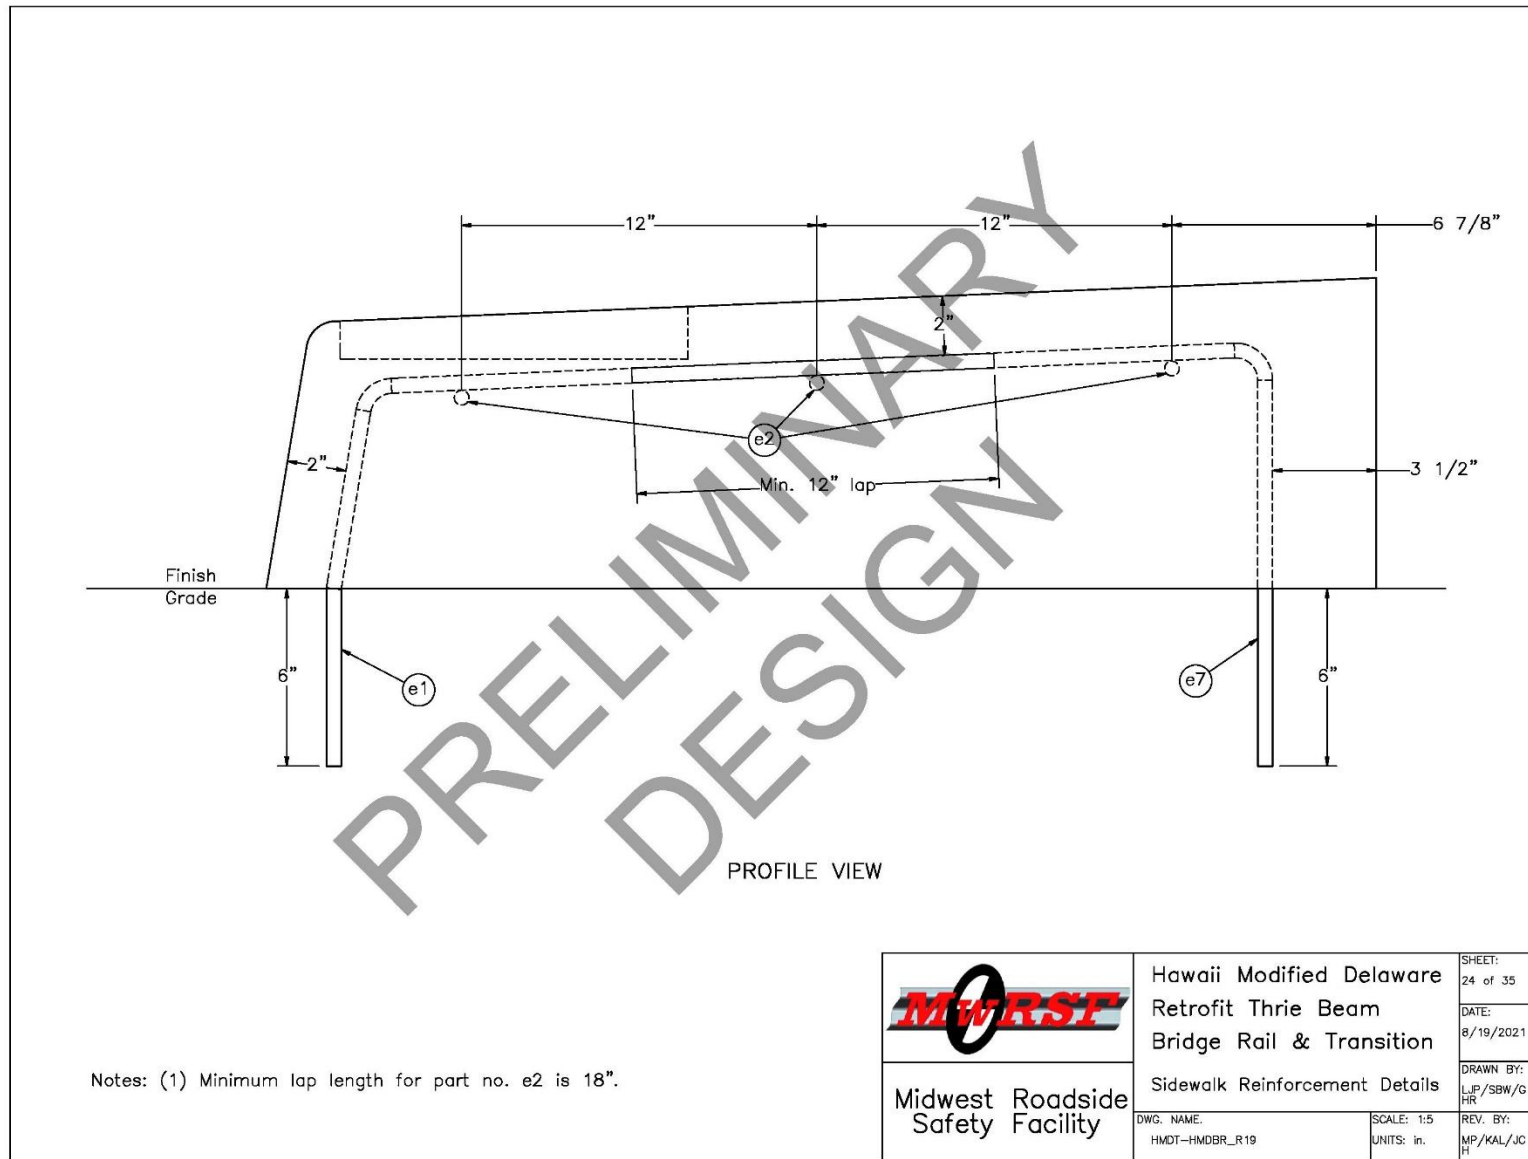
Sidewalk Reinforcement Details, Test No. HMDT-1
